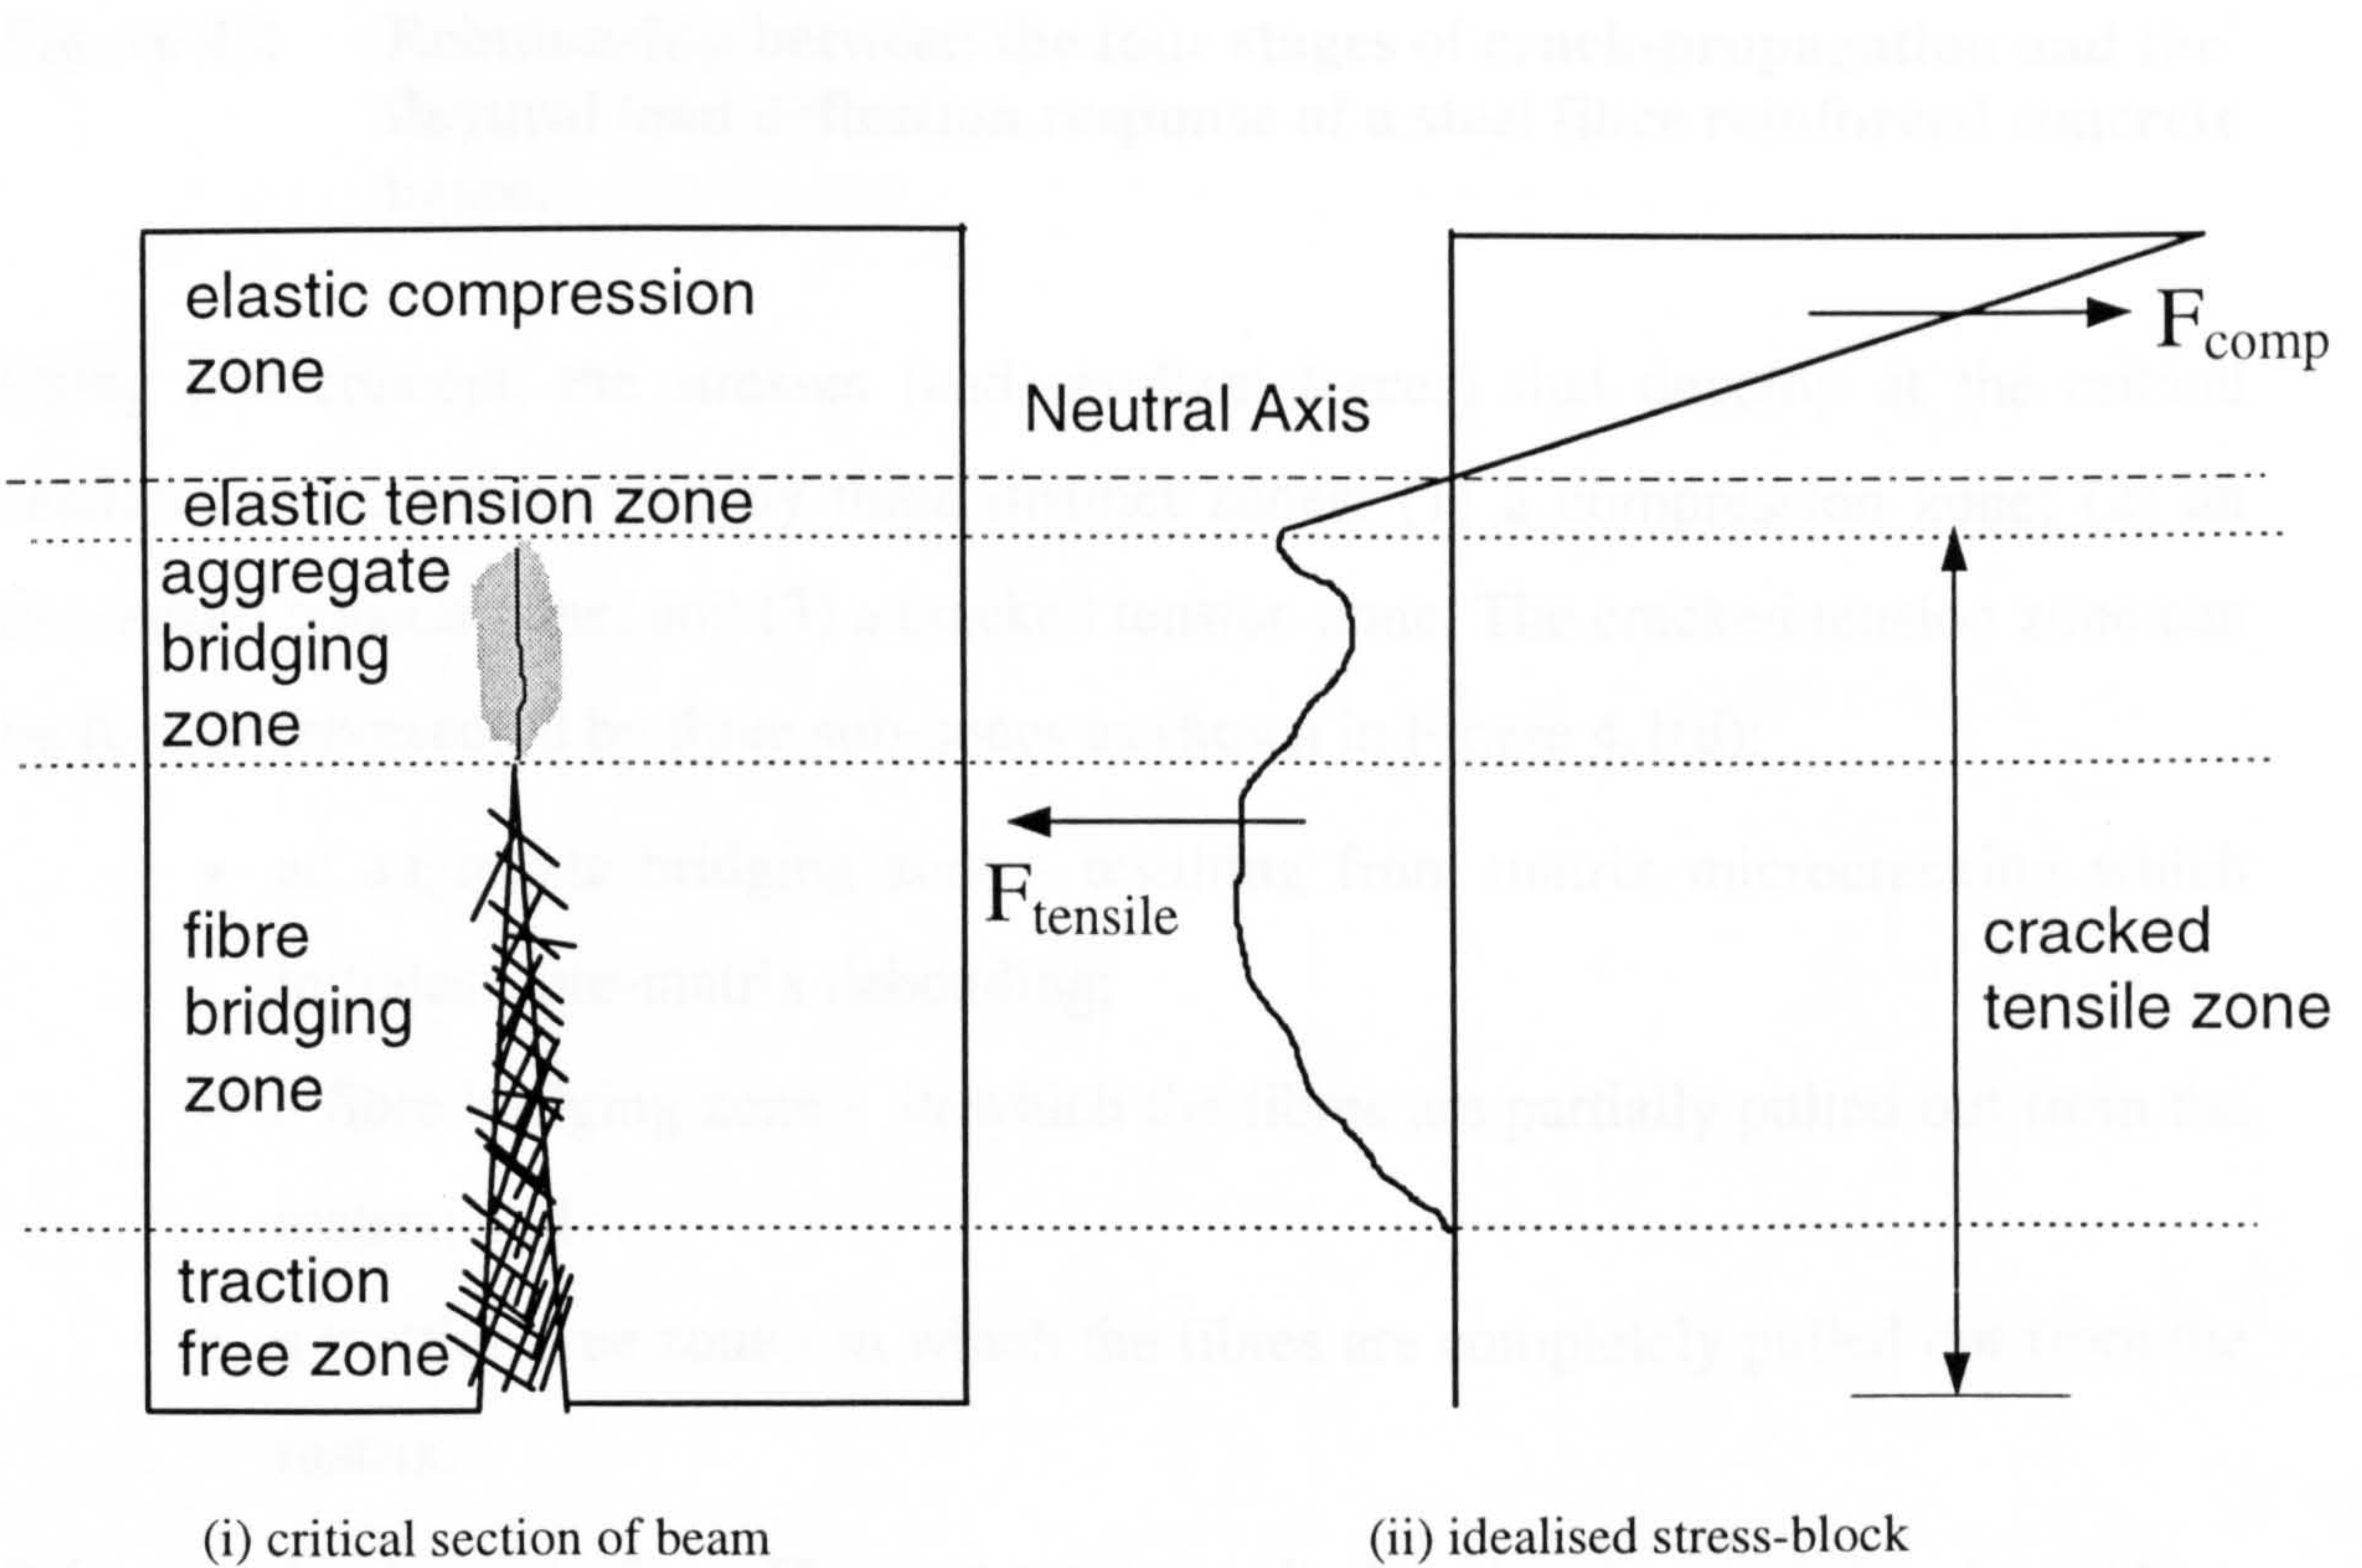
(d) Schematic representation of a steel fibre reinforced concrete beam under flexural loading: Stage 4 - development of traction free zone.
